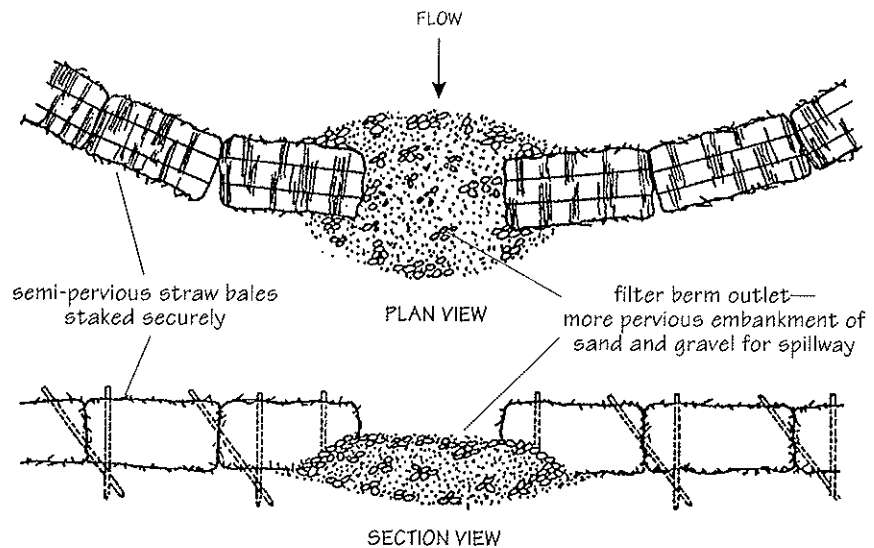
Details of straw-bale sediment barrier construction. (Adapted from Idaho Department of Lands, 1992.)
